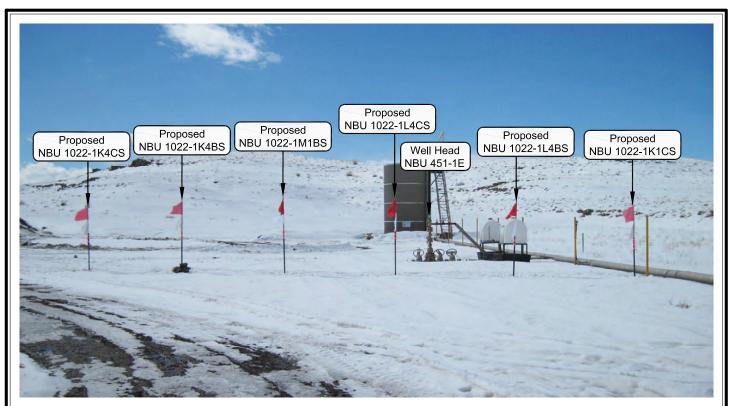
PHOTO VIEW: FROM CORNER #1 TO LOCATION STAKE
